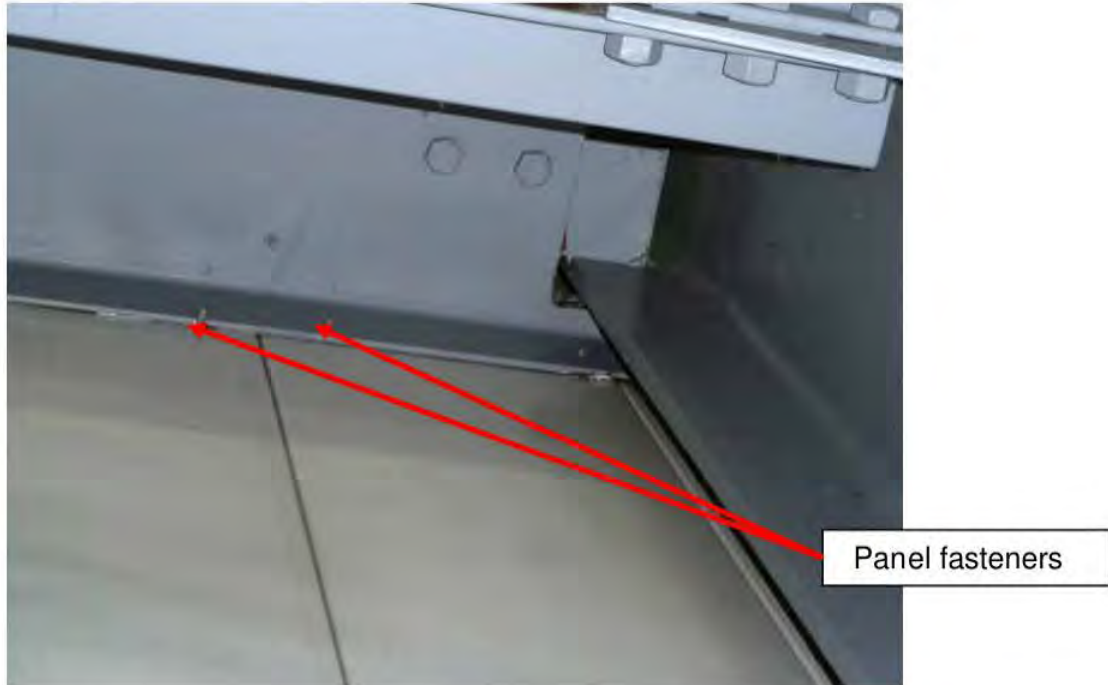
General View of Blowout Panel Fastener to Girt Flange
